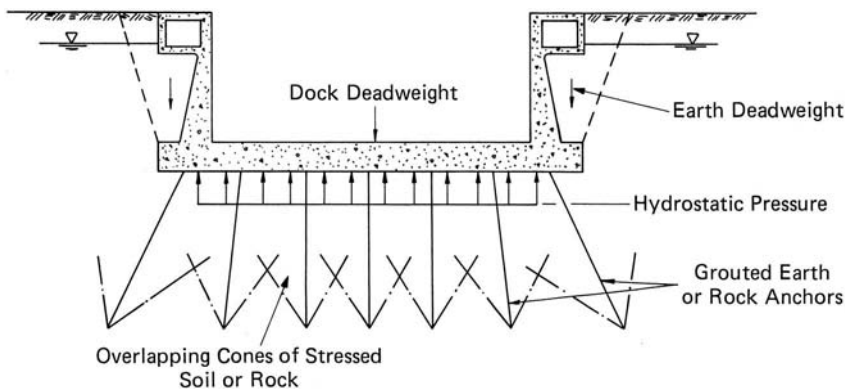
Basin dry dock with grouted tie-down anchors
